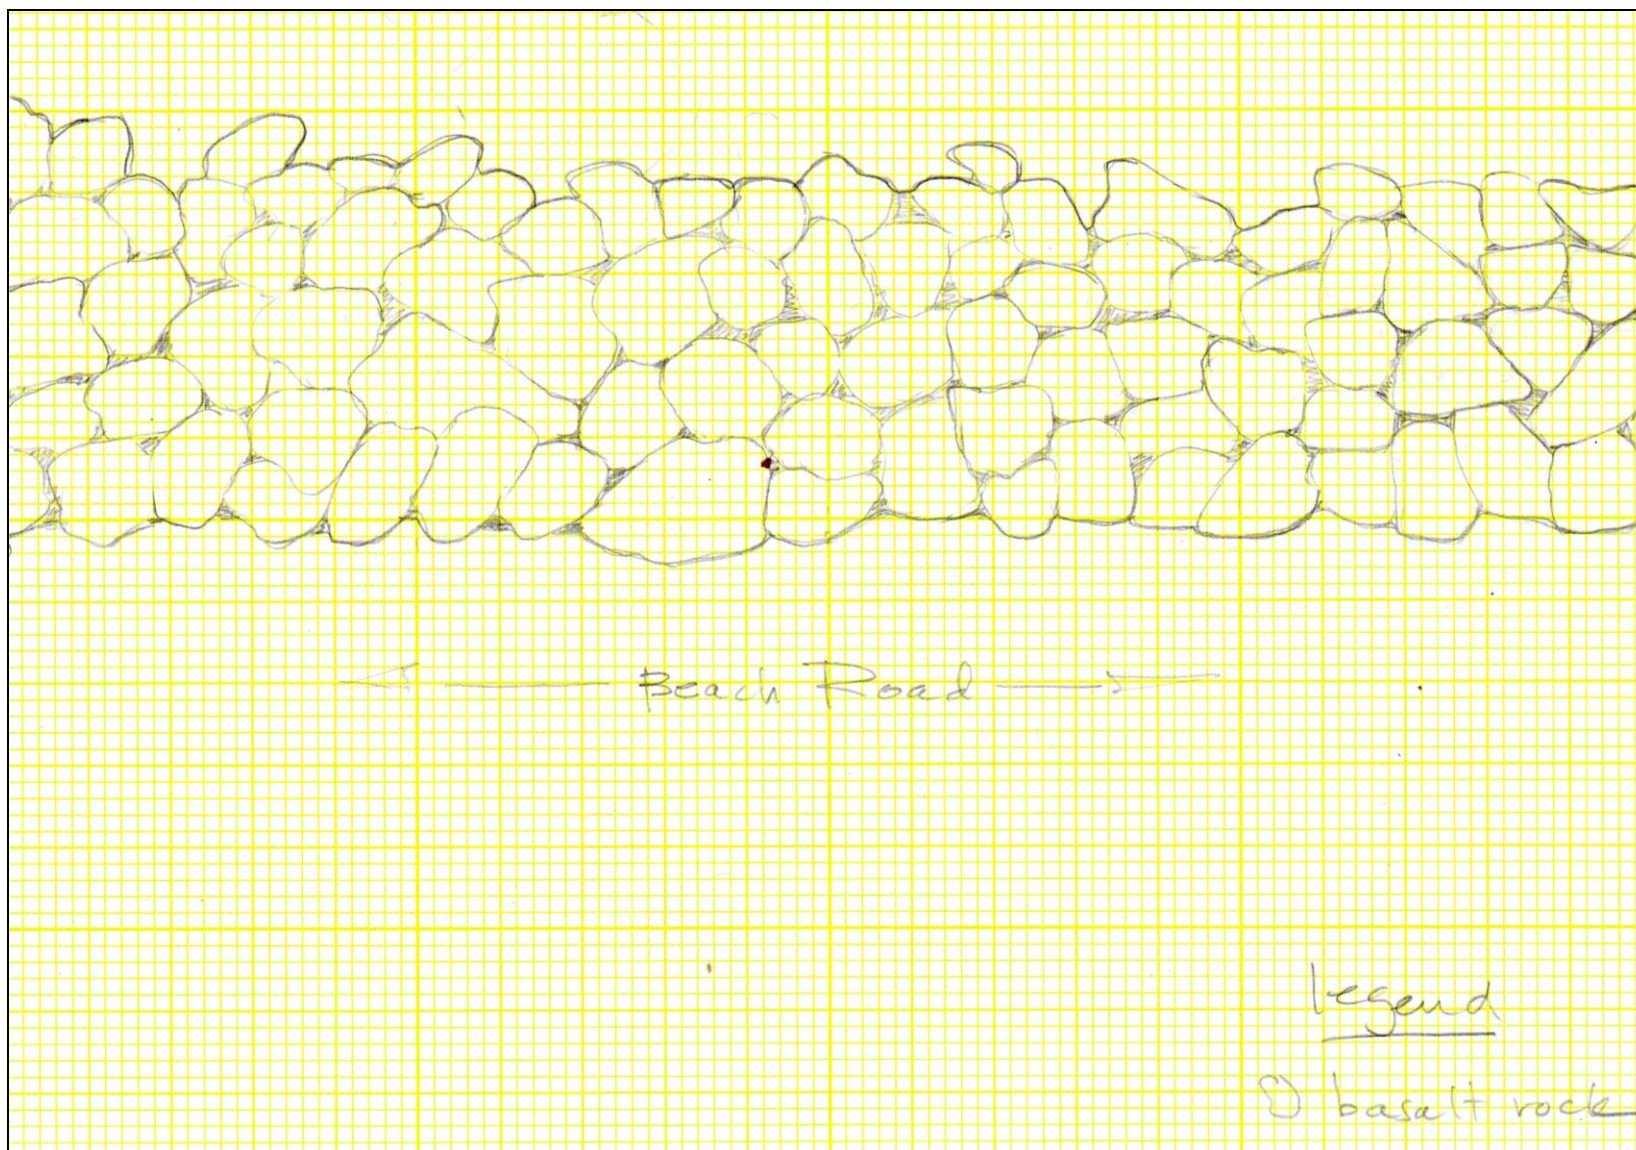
Site TS-1 Southwest Rock Wall Profile Showing Typical Wall Construction.
